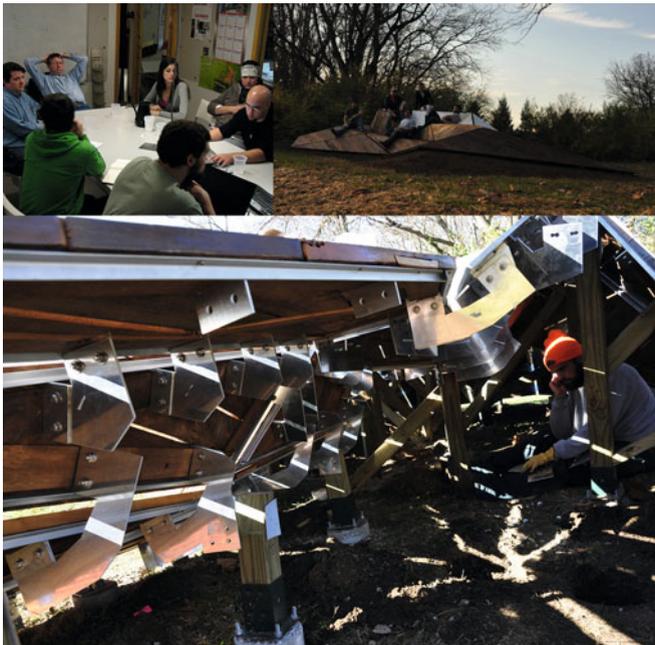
ReBarn: collaboration, assembly, and occupation (Zahner Metals tooled aluminum and barn siding)
